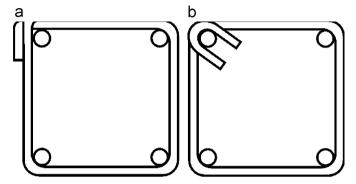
Conventional and modified tie configuration for reinforced concrete columns [12]: (a) conventional tie configuration; (b) modified tie configuration.
